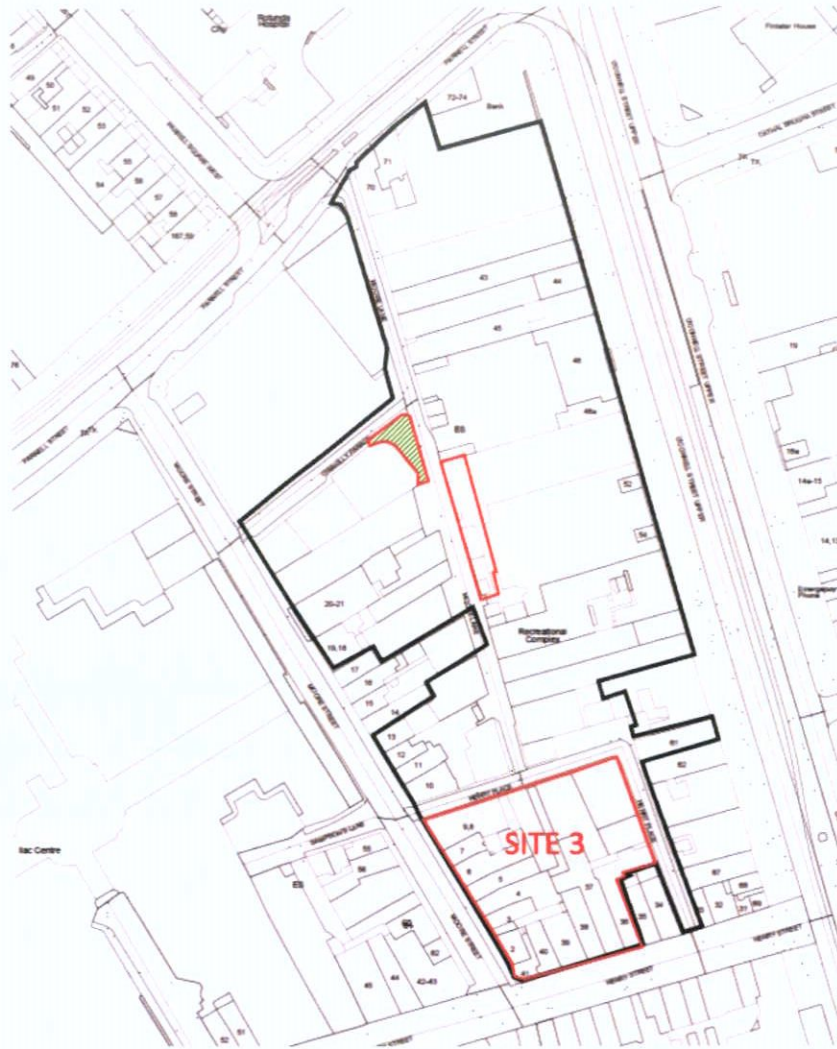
Planning boundary of Site 3 outlined in red, with the Dublin Central Masterplan site outlined in black.
